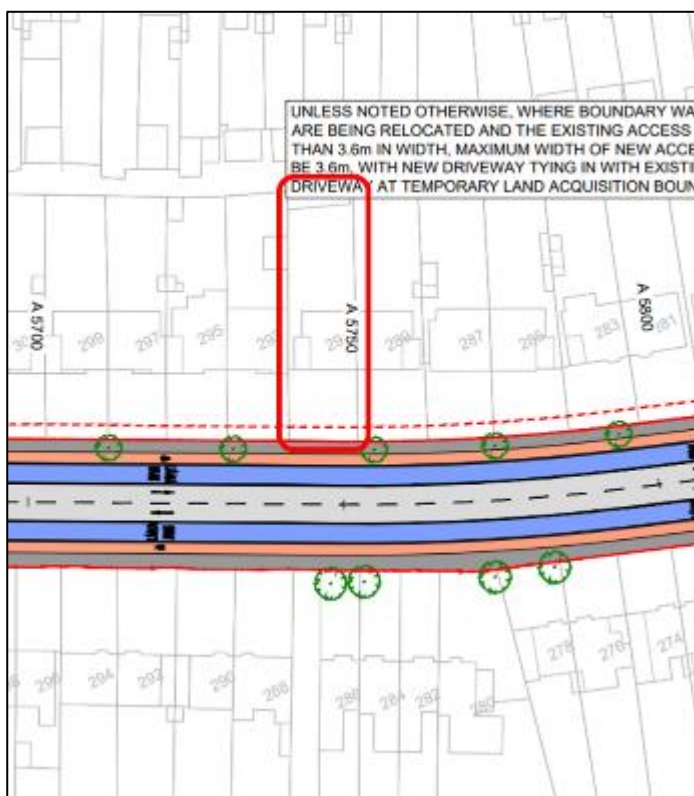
Proposed new Layout at 291 Navan Road
